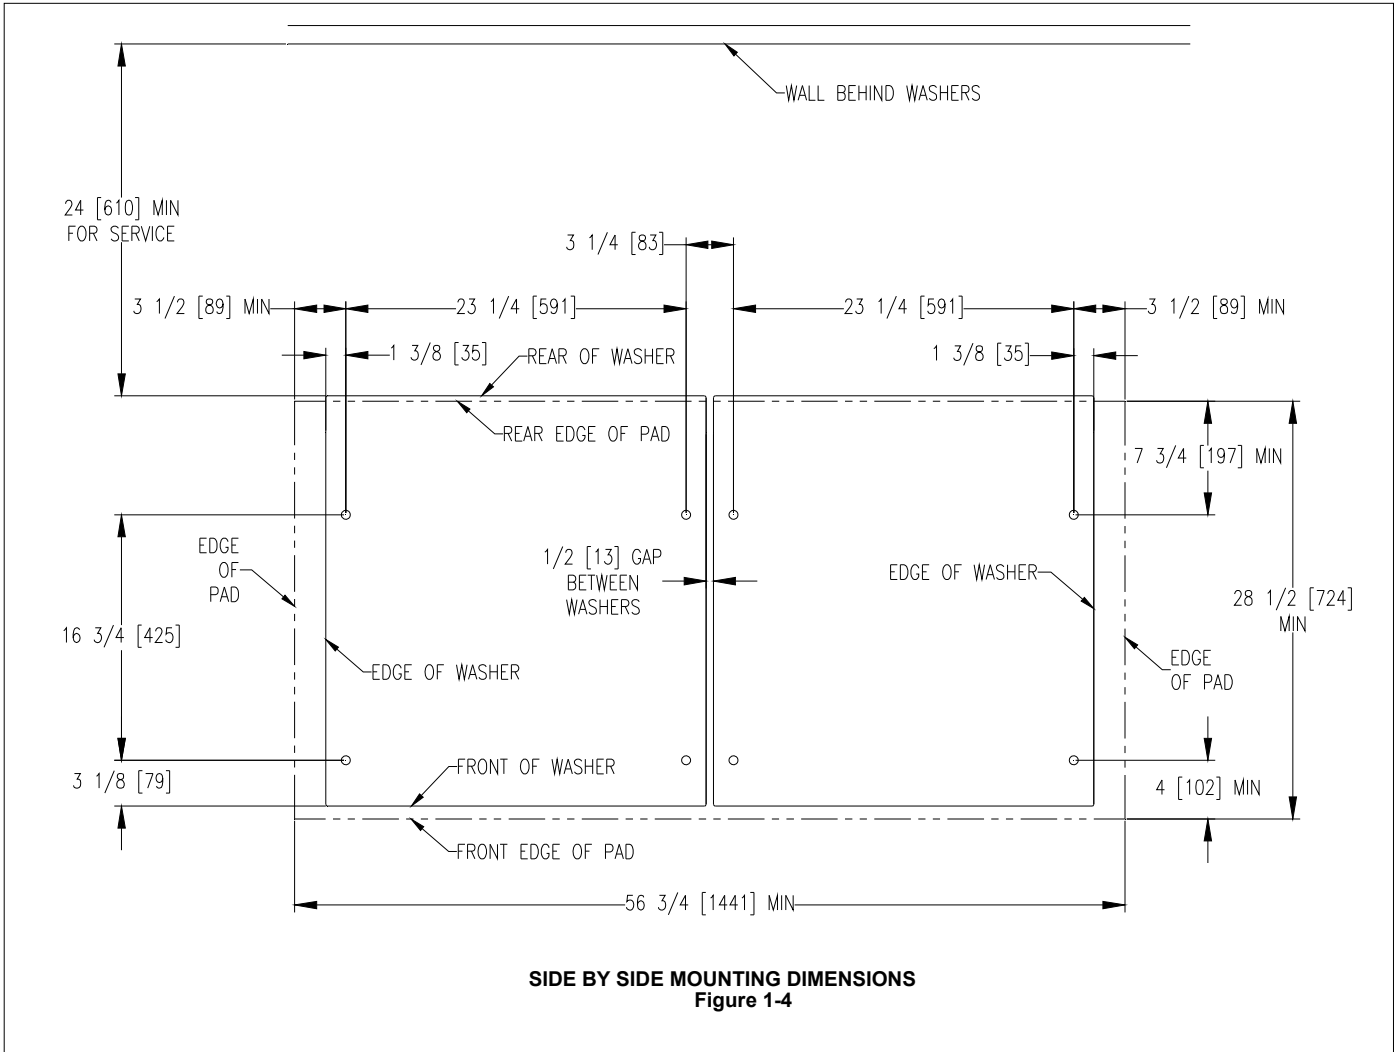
T-350 Machine Side By Side Mounting Detail
